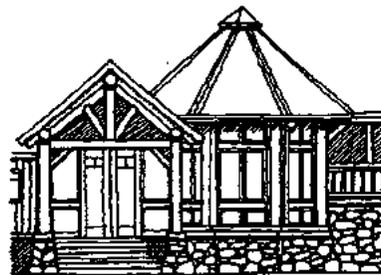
Entries should be inviting, with detailed structure, doors, and windows.
